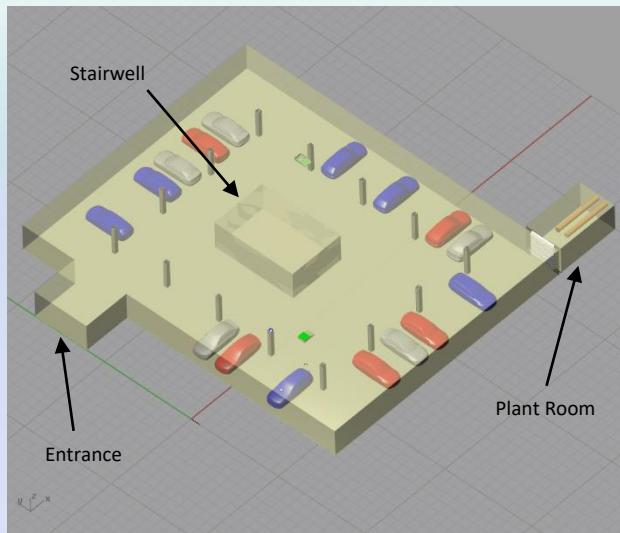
The underground Car Park with entrance, stairwell and plant room marked.
